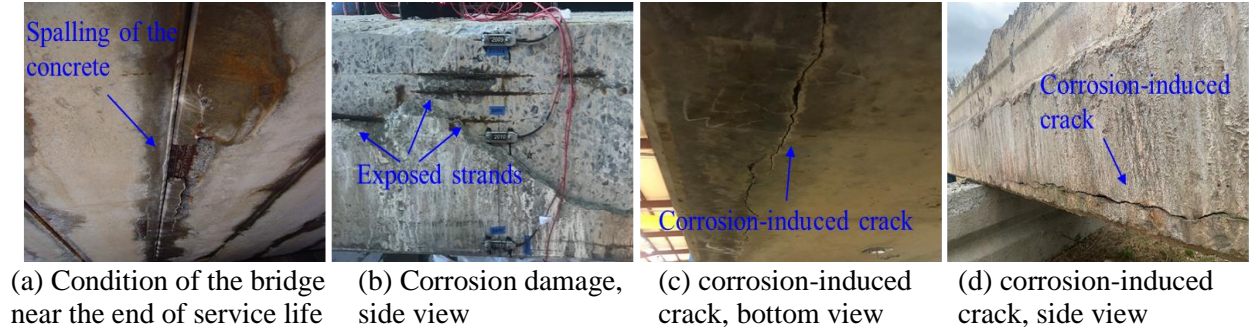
Corrosion-induced damage in box-section bridge girders at different locations.
